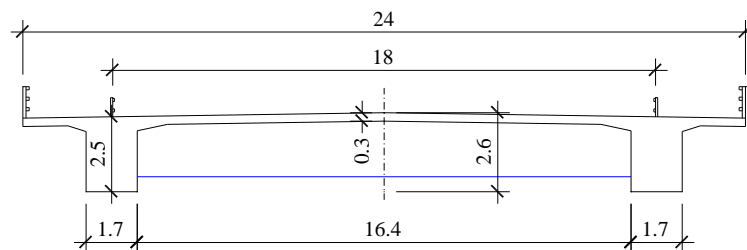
Deck cross-section of the 2nd Chongqing Bridge over Yangtze River
